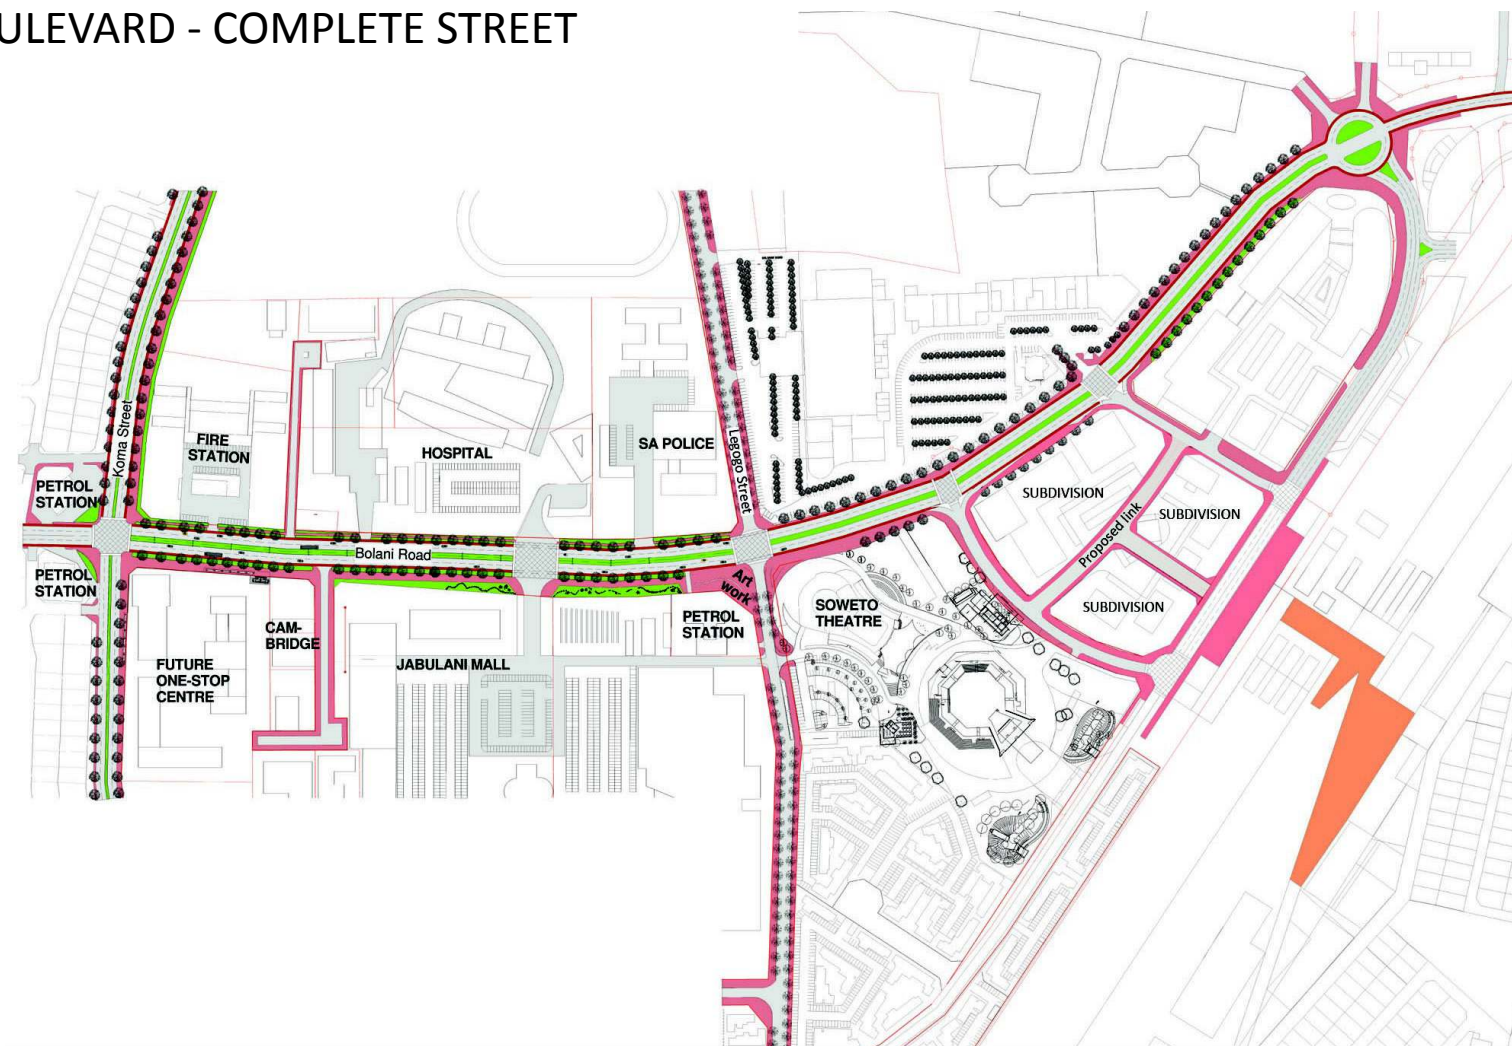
Concept plan showing the application of the Complete Street on Bolani Road
